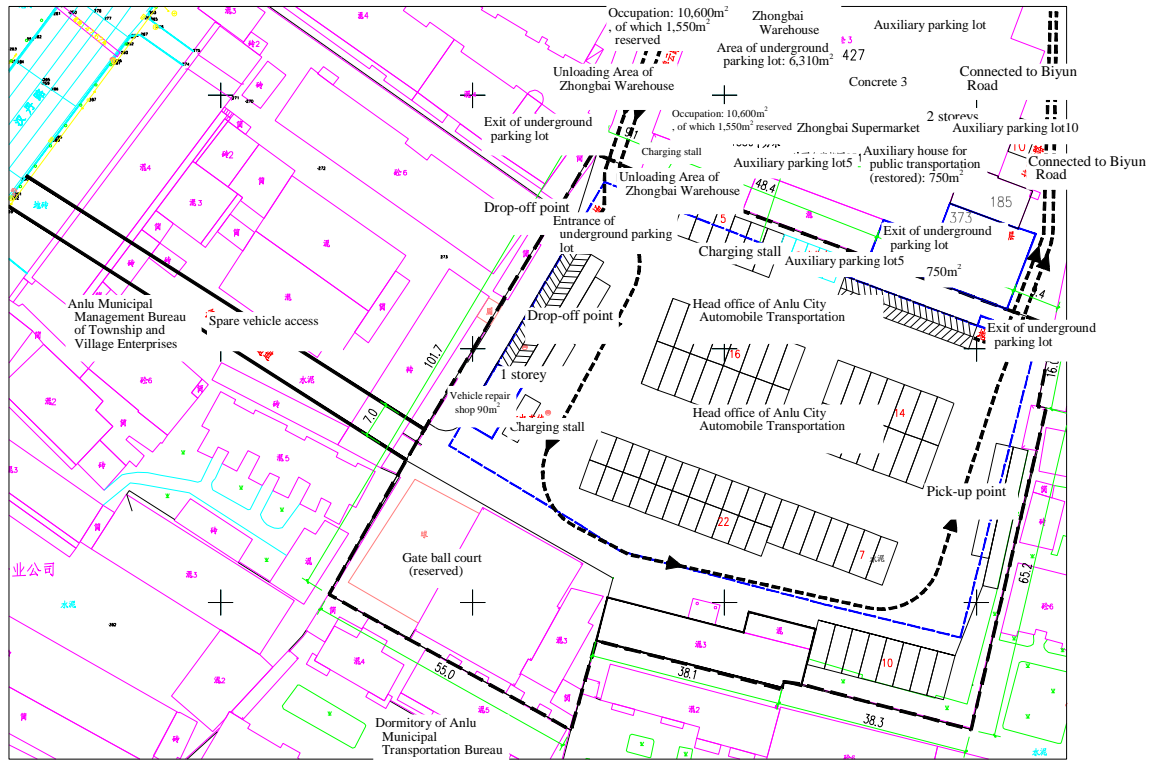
Sketch Map of Plane Layout Public Transportation Hubs of Short-Distance Stations
